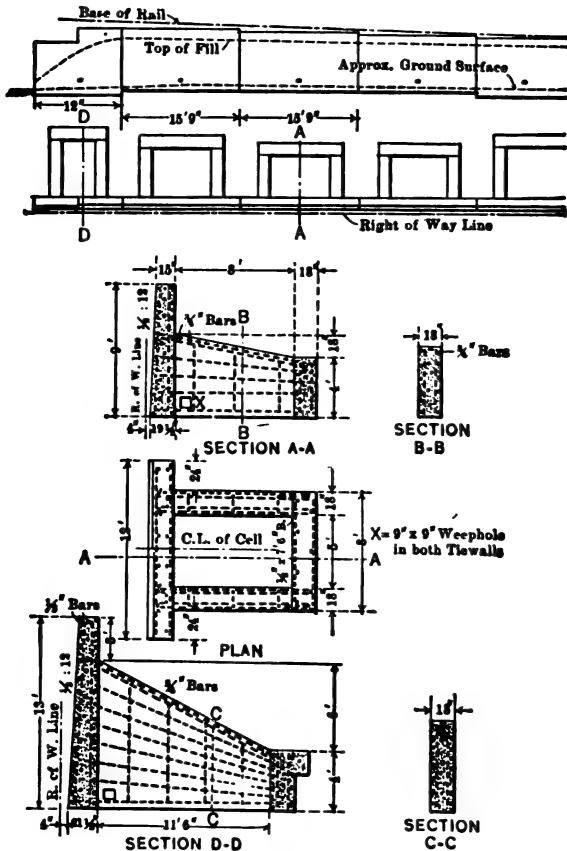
CELLULAR CONCRETE RETAINING WALL, C. M. & ST. P. RY.
